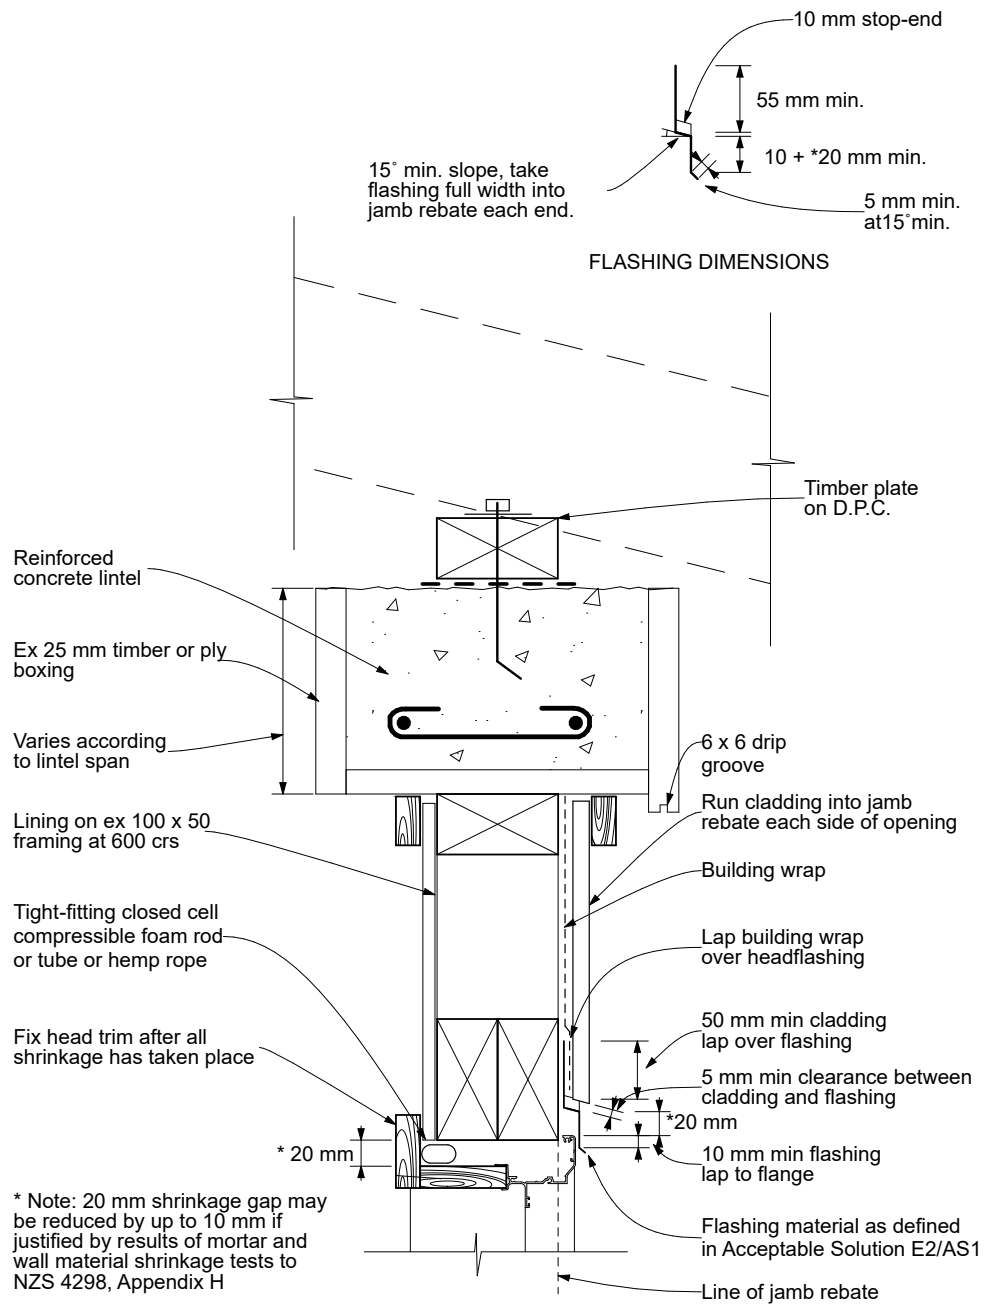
Window head – Aluminium joinery with timber-framed wall insert
